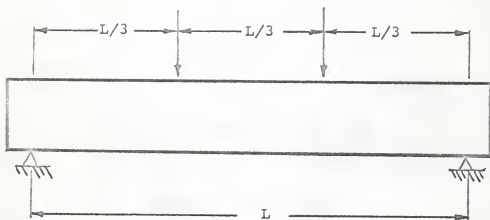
LOADING CONFIGURATION OF FLEXURE SPECIMEN
